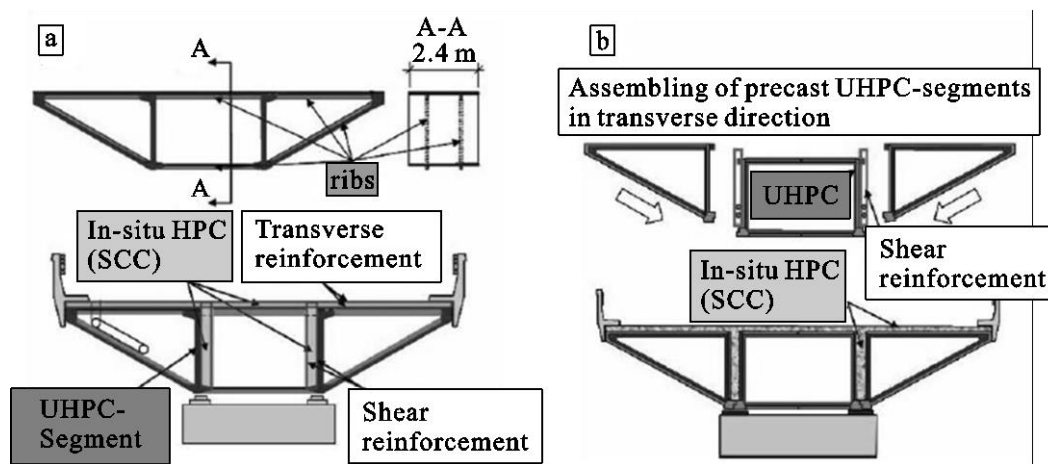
Cross-section of UHPC segmental bridge [Reichel 2008]
